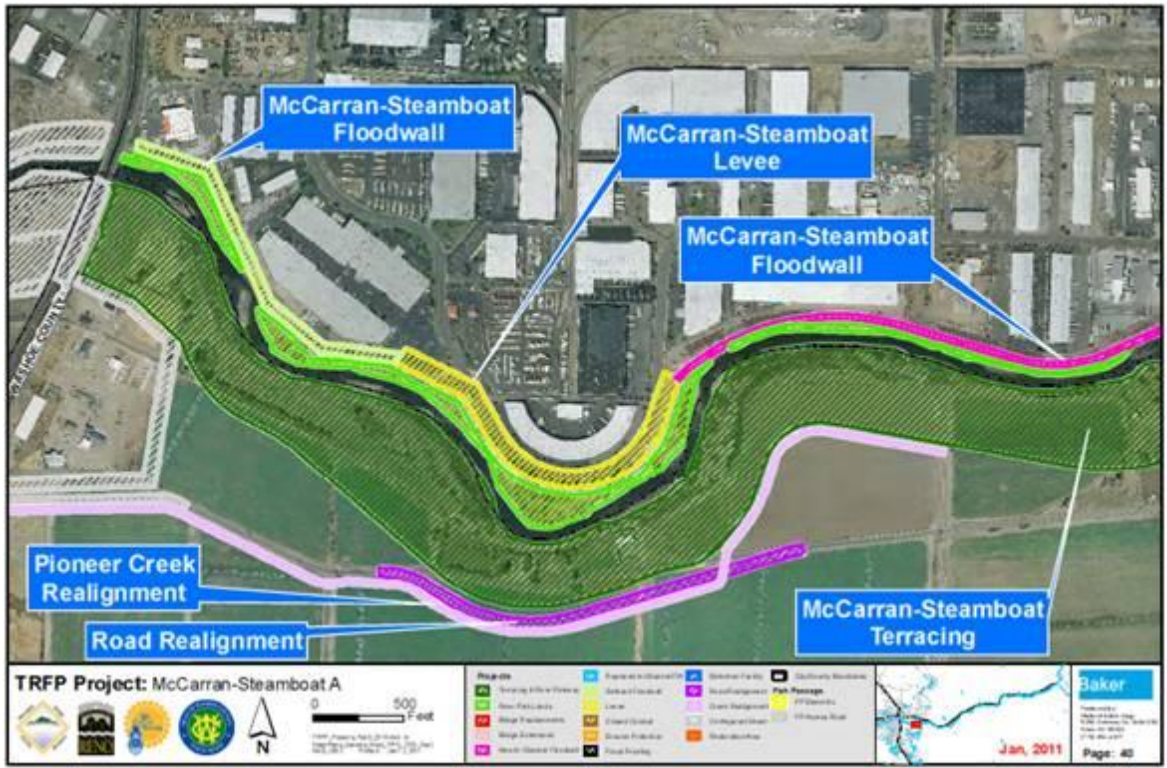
TRFMA Preliminary Project Plans from McCarran to Steamboat A
